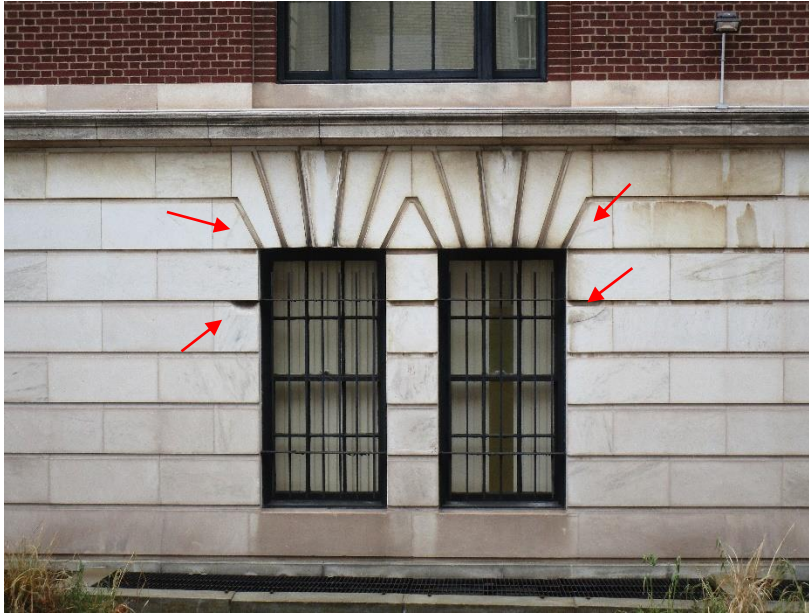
Spalls and cracks at marble where steel security grilles are set into the stone.
